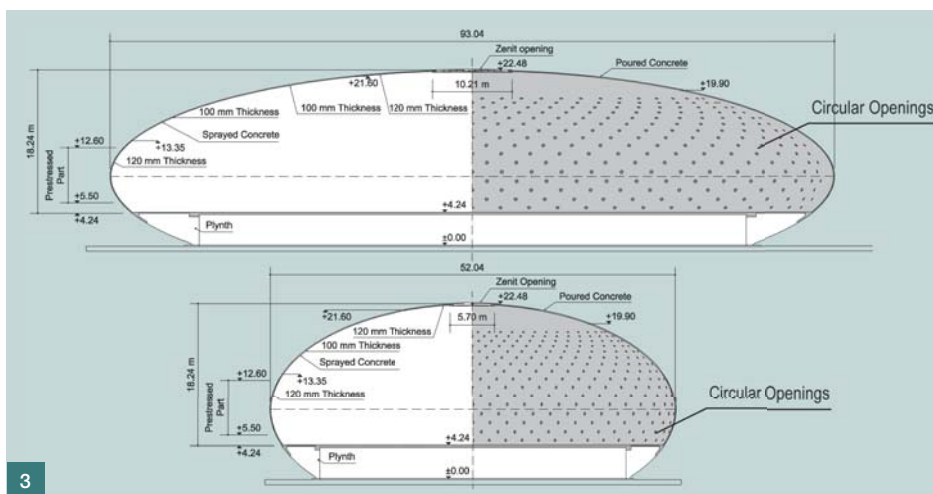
Main geometrical dimensions, a) section along the major axis, b) section along the minor axis
